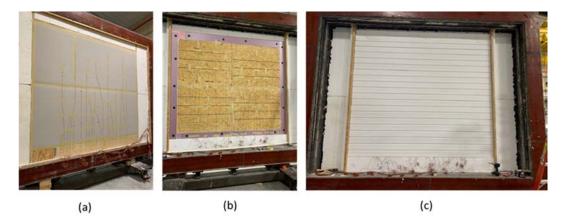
The figures show the construction of the panel used for the guarded hot box measurements. (a) is the interior wall section or the metering side. (b) is the construction of 4 VIP/PIR composite panels to form a complete wall section on the climate side. (c) is a finished wall with vinyl siding on the climate side.
